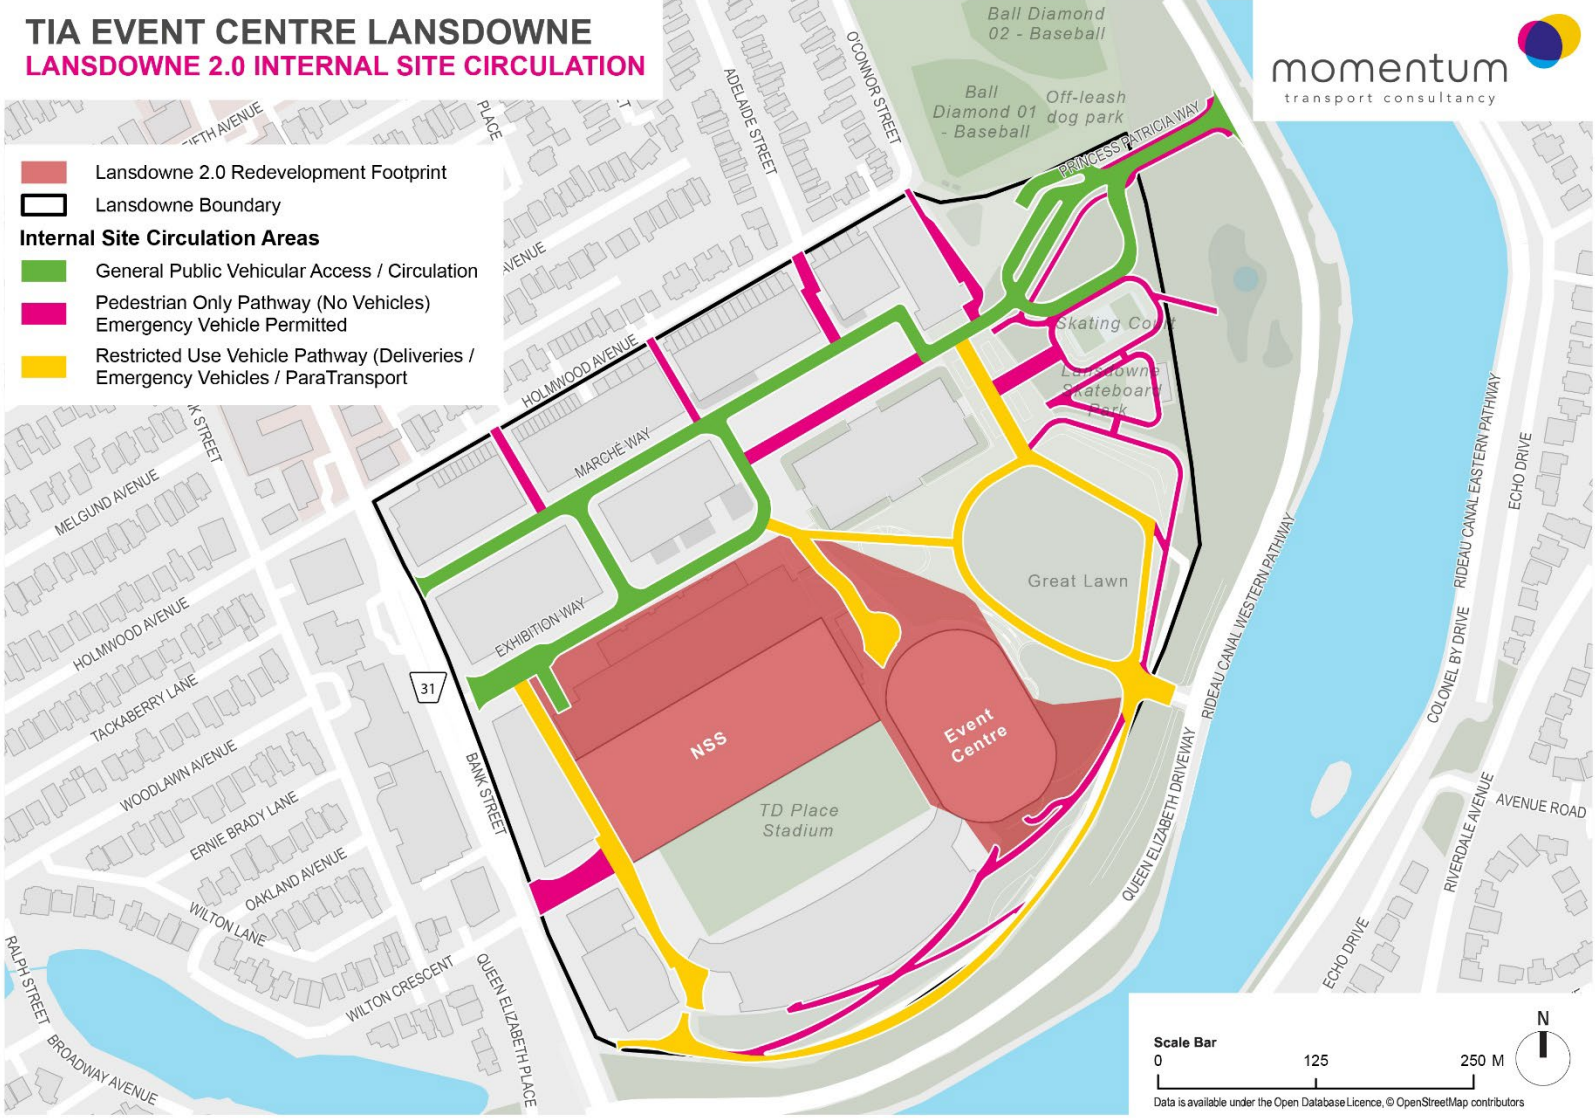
Lansdowne 2.0 Internal Site Circulation Plan (Minor Events)
